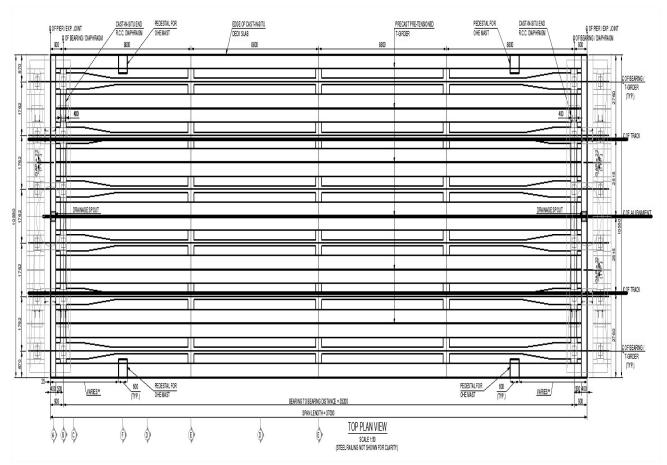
Plan view of 37m Span (6 – T Girder Straight Span)
